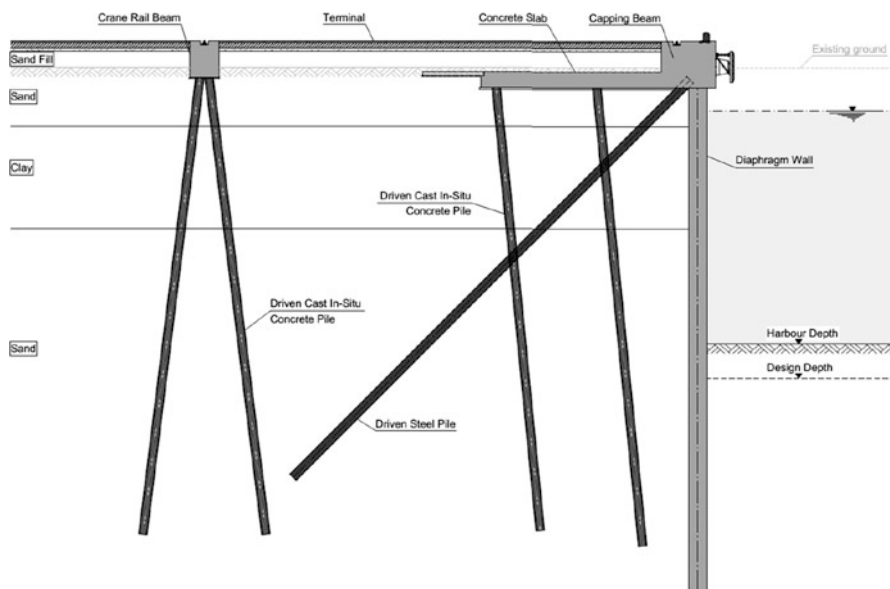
Anchored diaphragm wall with shielding slab (cross section)
